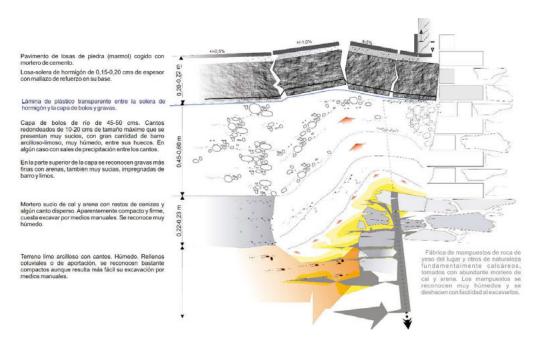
Outlined explanatory diagram of the situation observed during the excavation of pit 2. The figure includes the cement grout injections, which were injected-infiltrated between the gypsum rock masonry of the very foundation of the Church walls. These gypsum rock fragments are sometimes recognized as broken and displaced; enclosed within a grey-whitish mass (in yellow).
